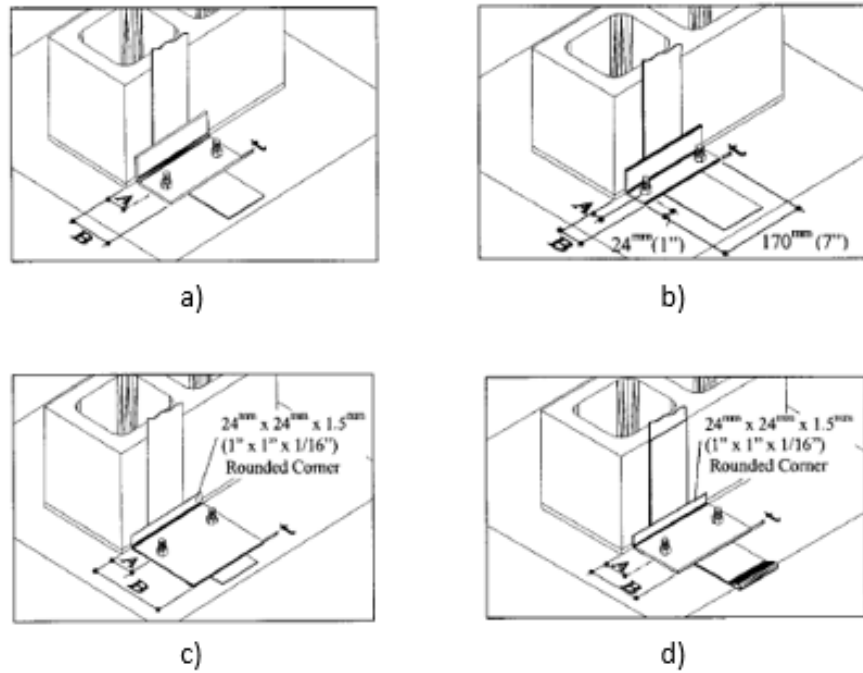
Anchoring GFRP against CMU wall (adapted from Hall et al., 2002)
